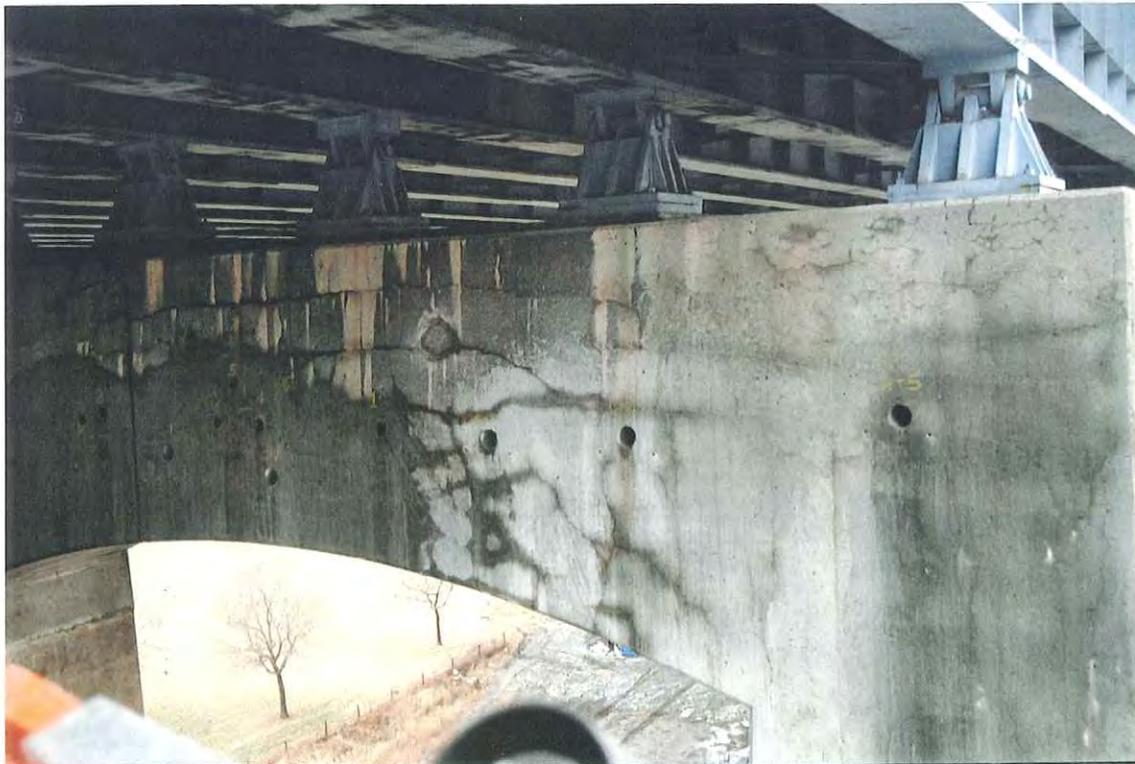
South face of Pier 39 north-bound showing locations of cores. One additional core was taken in the column at the right side of the photo.
